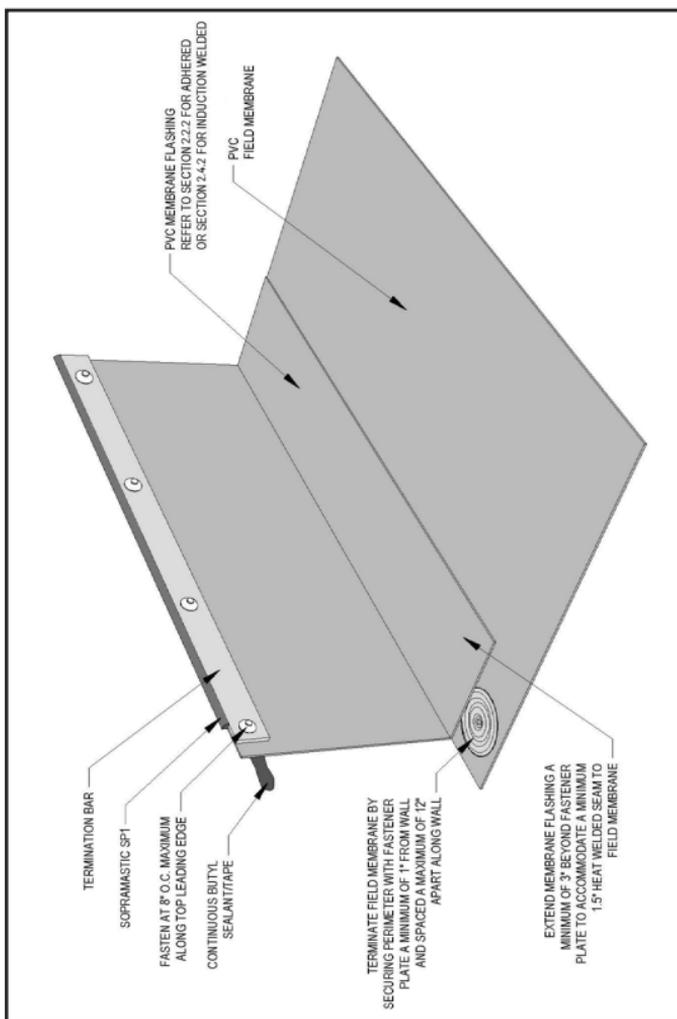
PVC Field Membrane At Wall/Curb With Horizontal Perimeter Fastening
